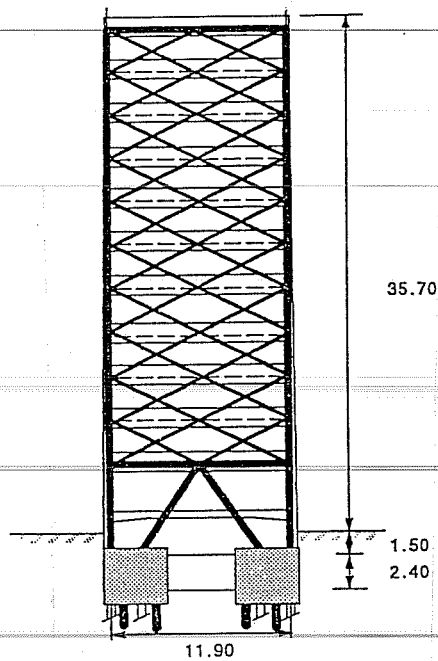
The Durango Building Retrofitted with Steel CBFs
